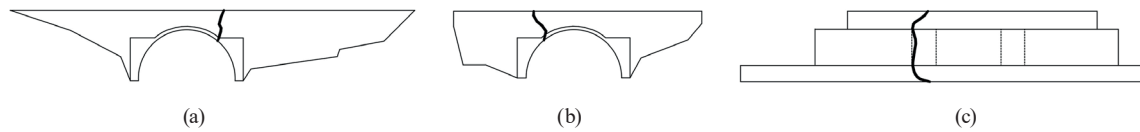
Failure mechanisms of Irgandi Bridge for DD-1 earthquake level (a) Downstream façade, (b) Upstream façade, (c) Plan layout
